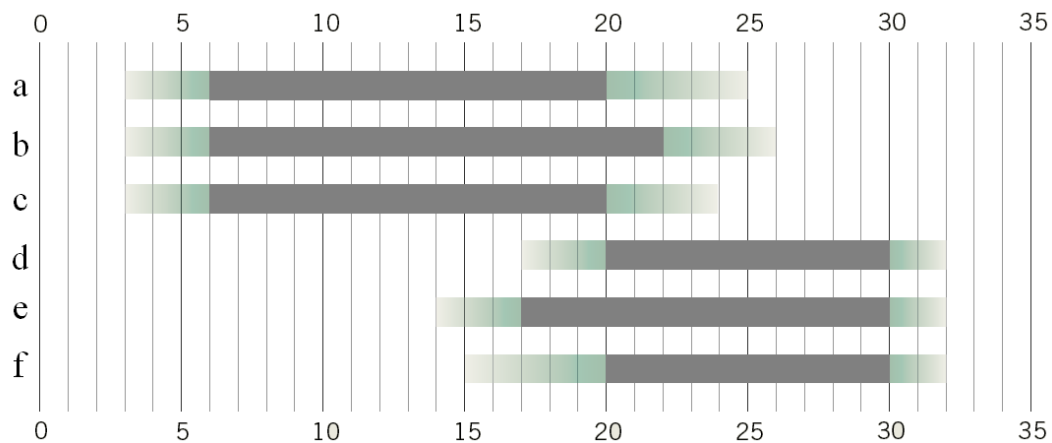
Recommendations for different span lengths in different types of simply supported timber bridge decks. (Martinsons, 2010)
